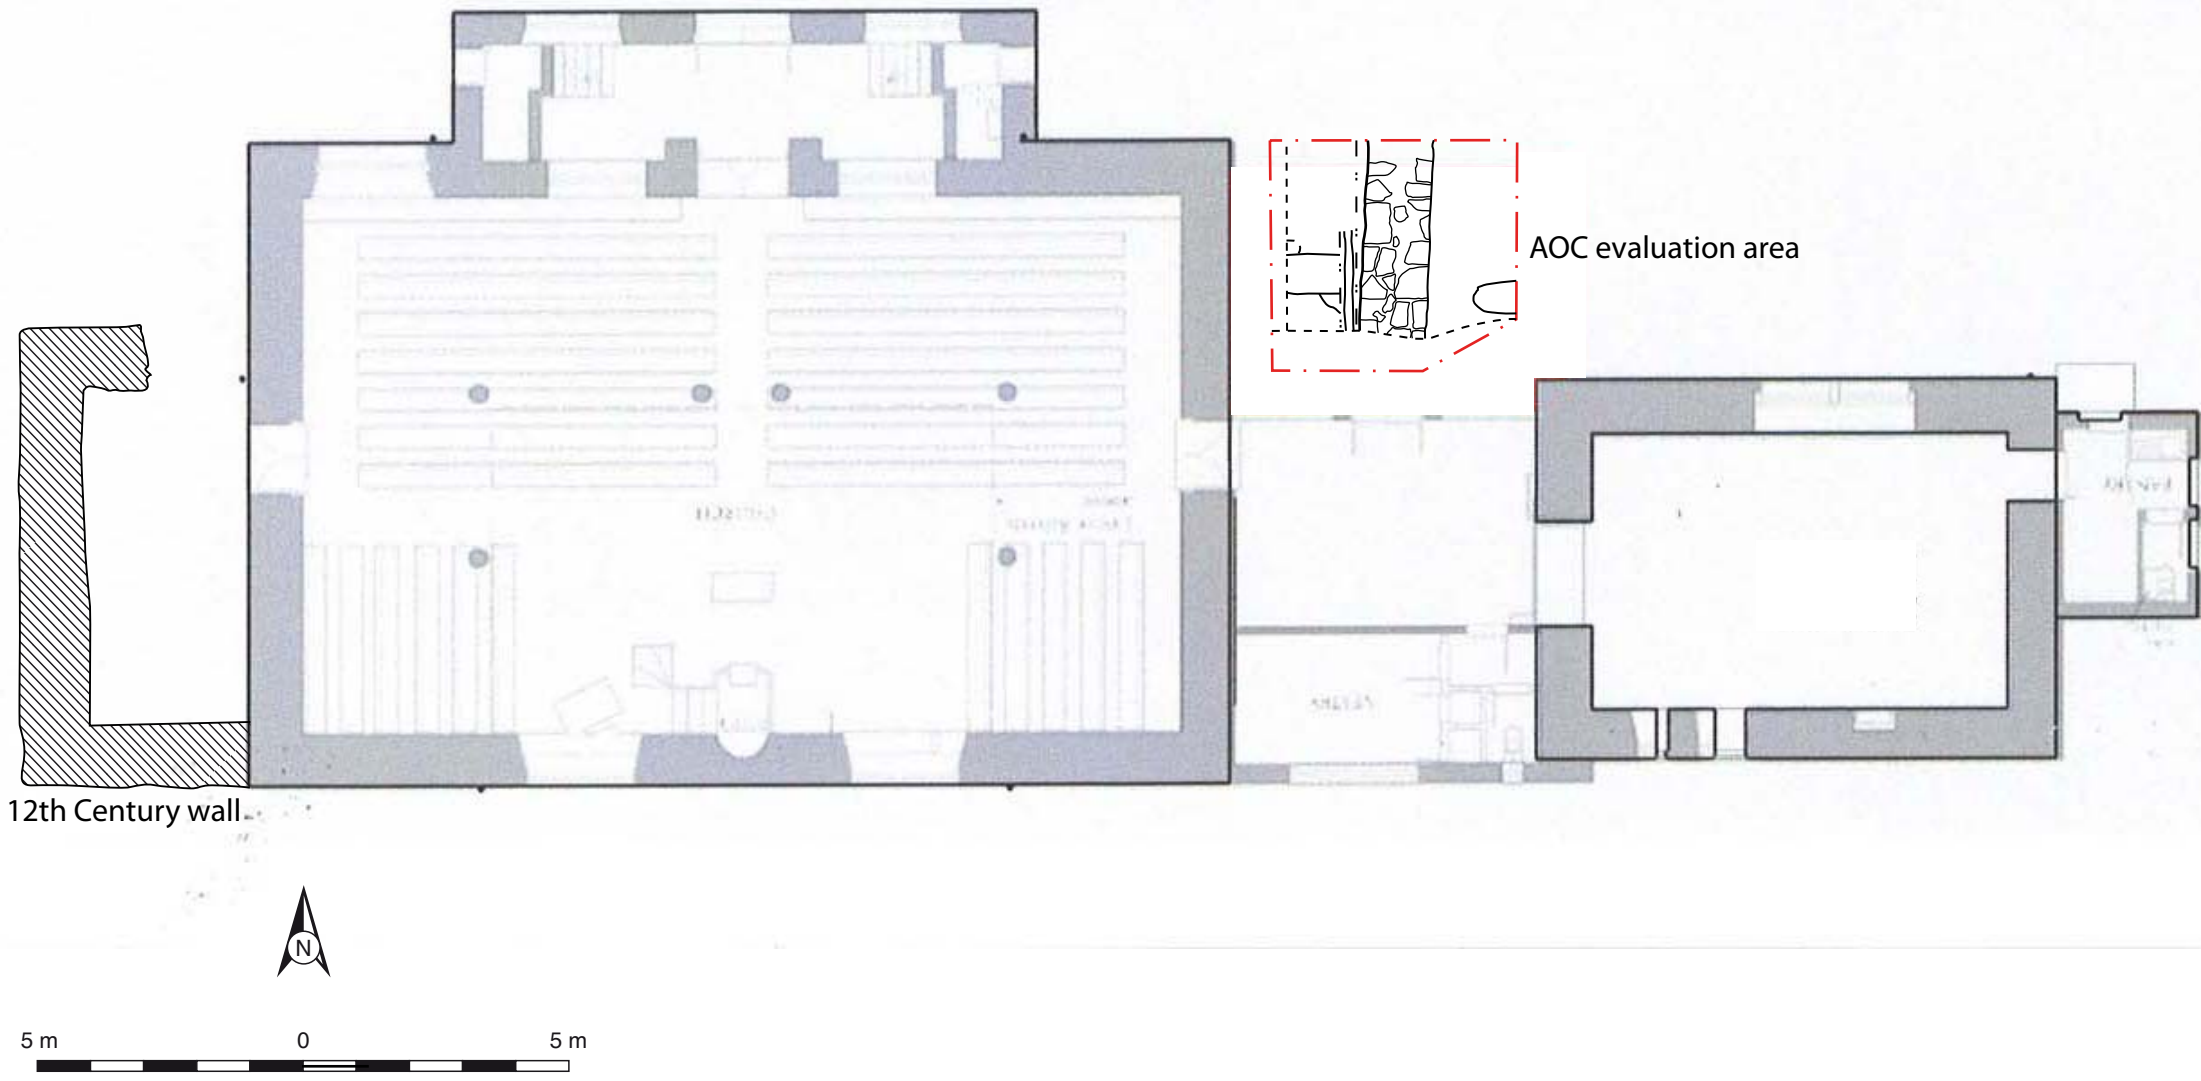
Plan of Currie Kirk, showing wall in relation to existing church and 12th century remains
